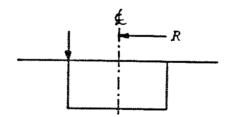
EXAMPLE 5.3 - THREE-SPAN CURVED PRESTRESSED CONCRETE BRIDGE Choudhury [30]
